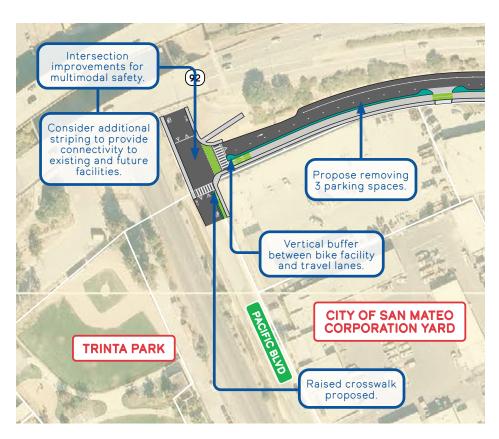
B PACIFIC BOULEVARD INTERSECTION CONCEPT PLAN
